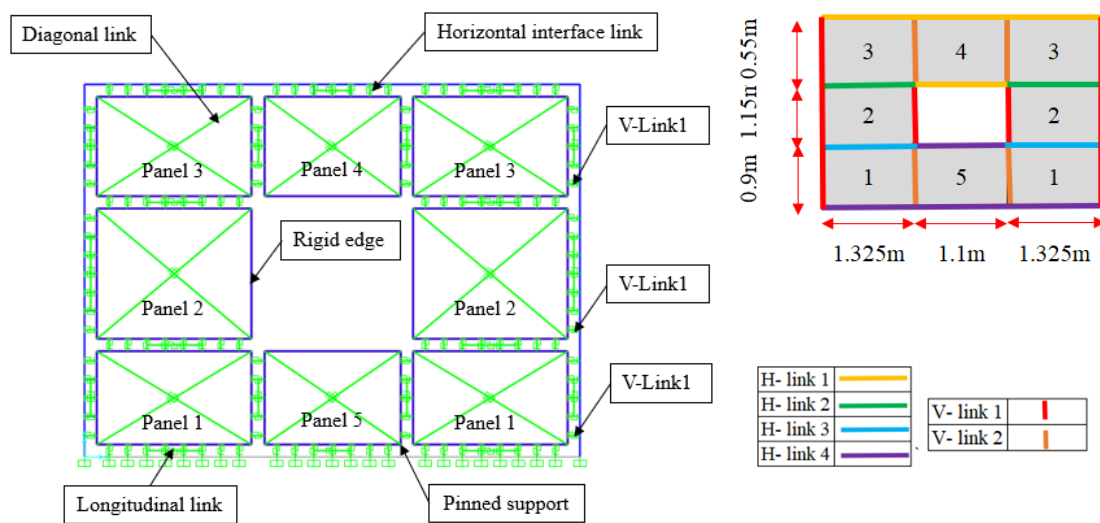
Modeling of masonry infilled frame with window opening Method 2
